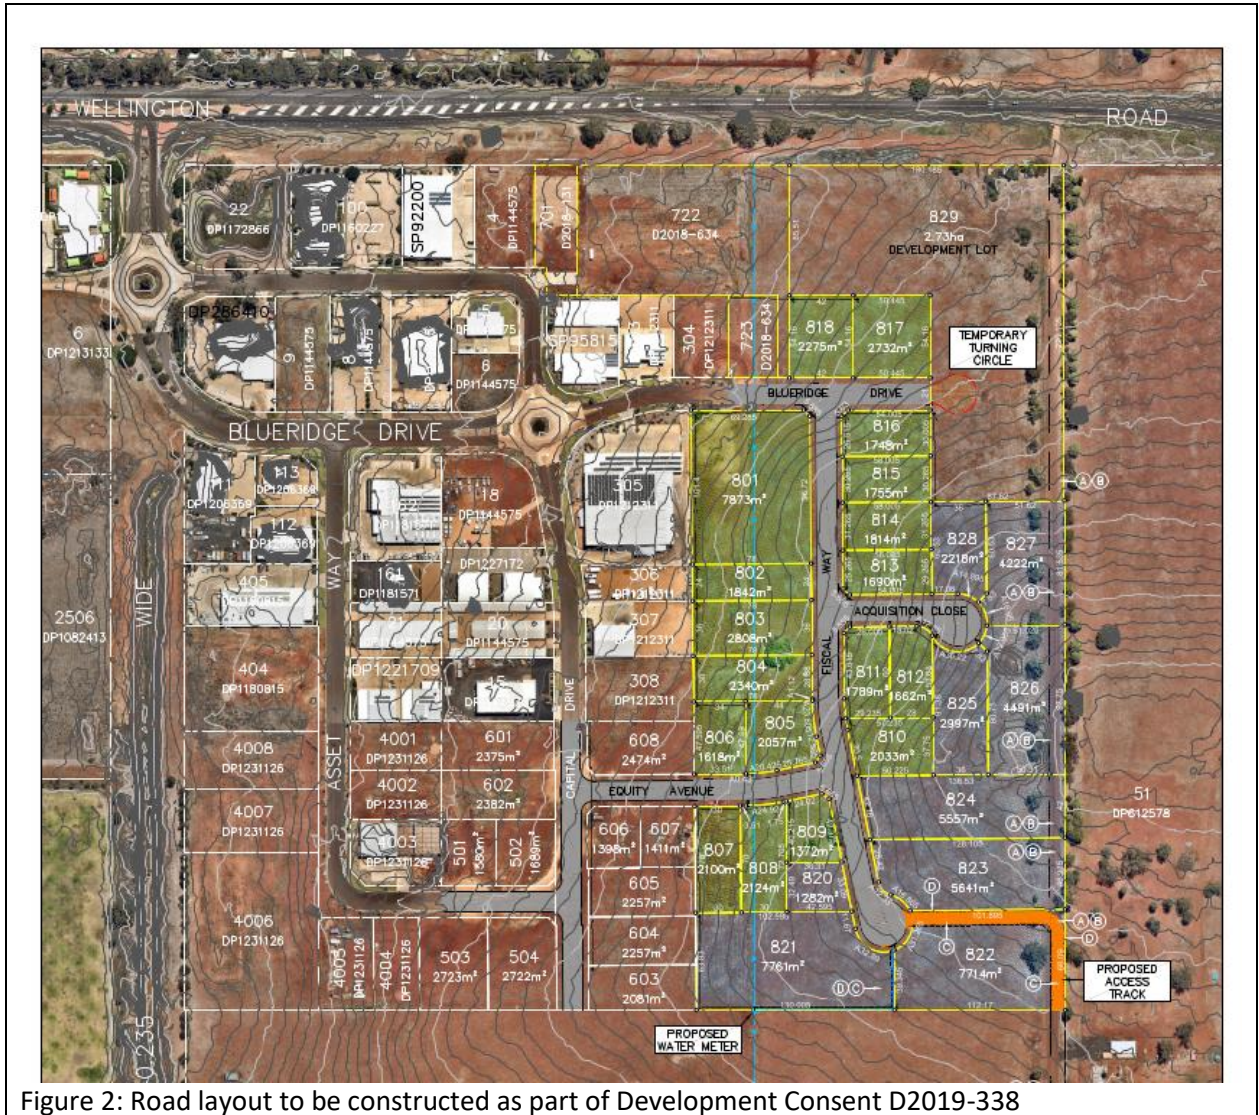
Road layout to be constructed as part of Development Consent D2019-338
